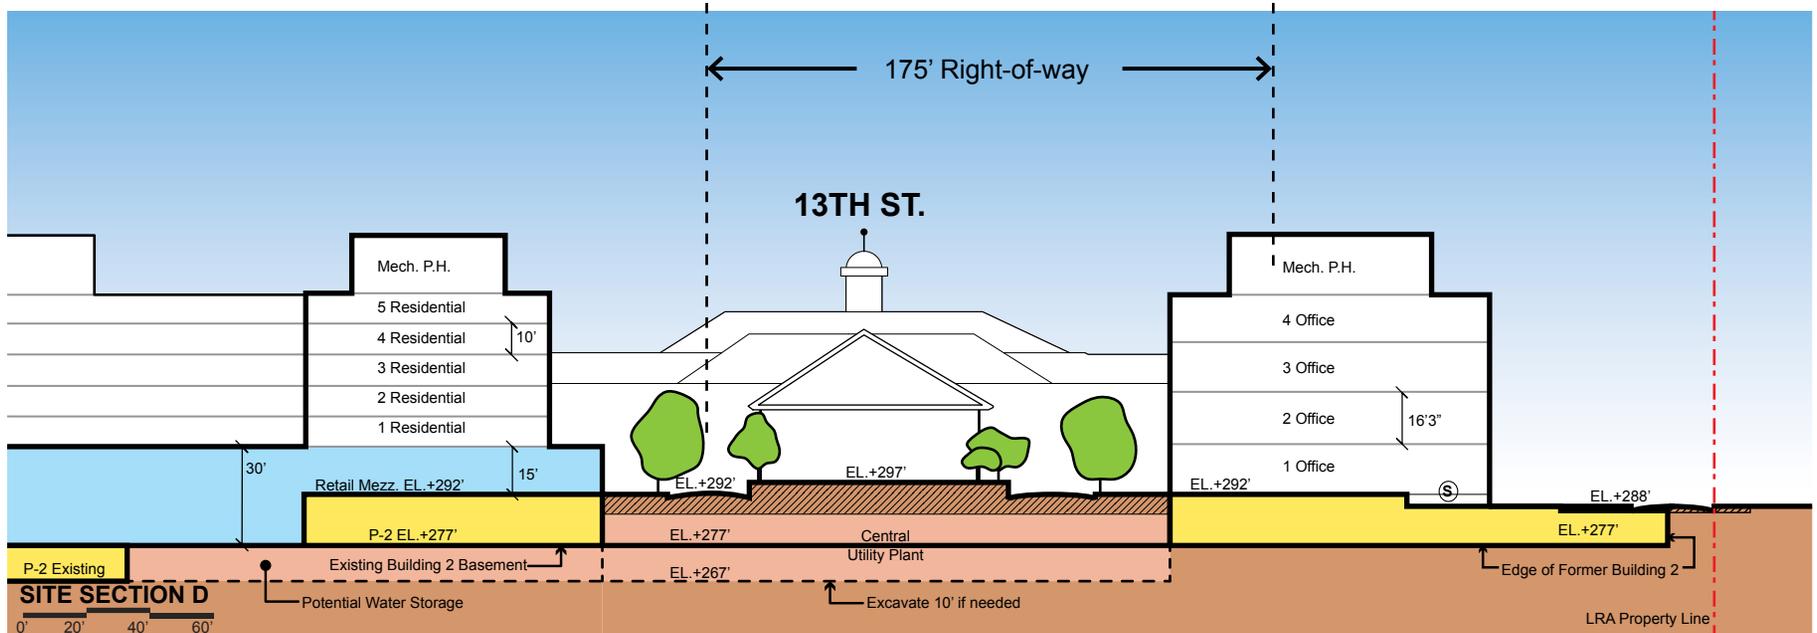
Town Center Site Section. Source: Perkins+Will.
